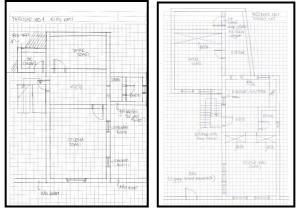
& Figure 1.4 An Example of the Sketches studied in the Site Survey: The Plan Layout of Yağcılar 1
